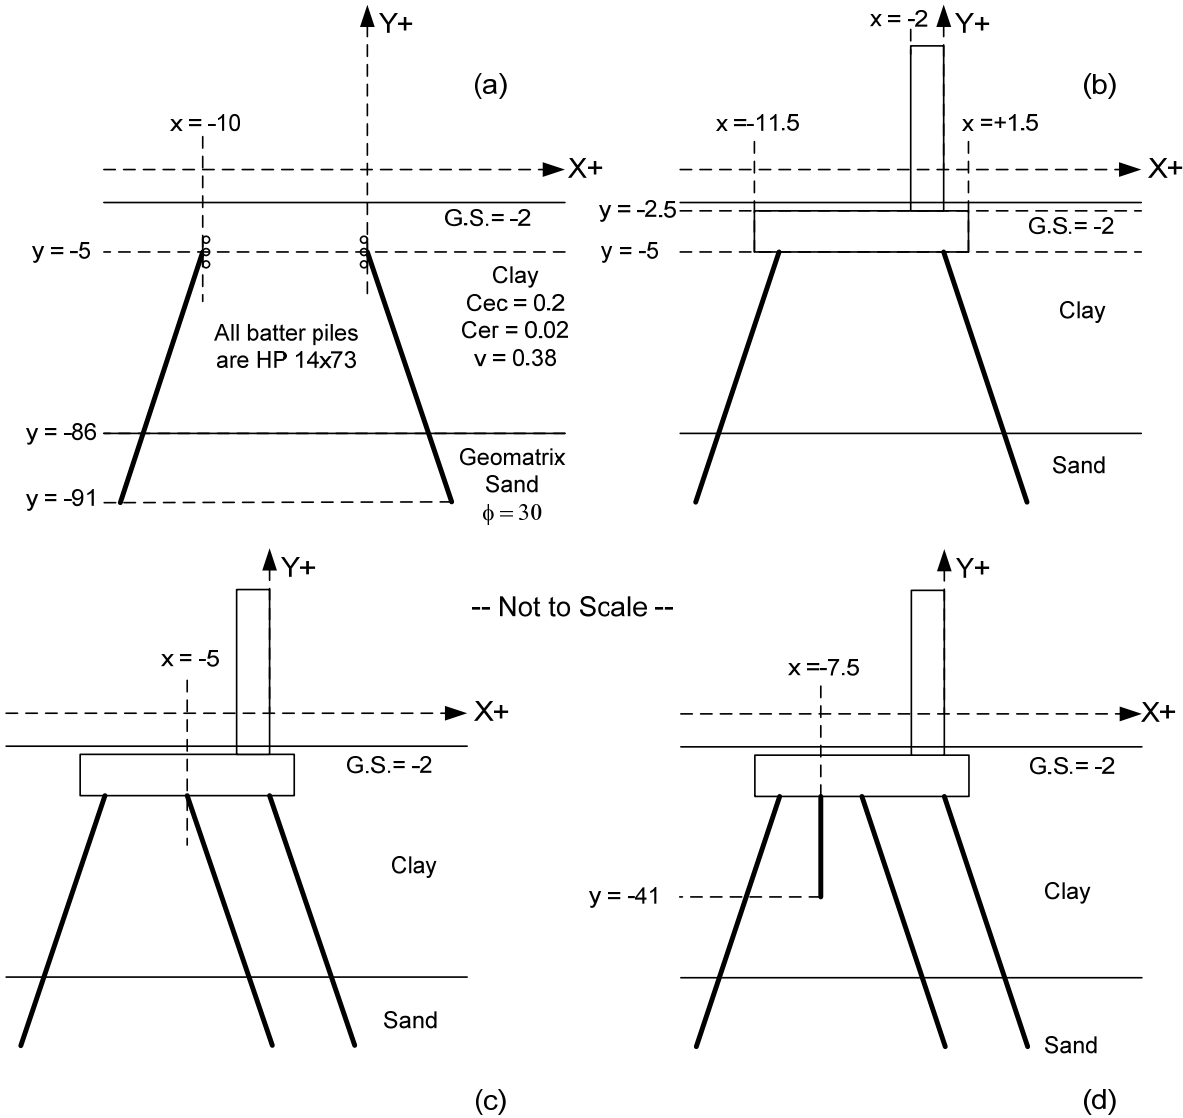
(a) Pair of batter piles with roller supports, (b) Pair of batter piles pinned at base of T-Wall footing, (c) Three batter piles pinned at base of T-Wall footing, (d) Three batter piles plus sheet pile pinned at base of T-Wall footing
